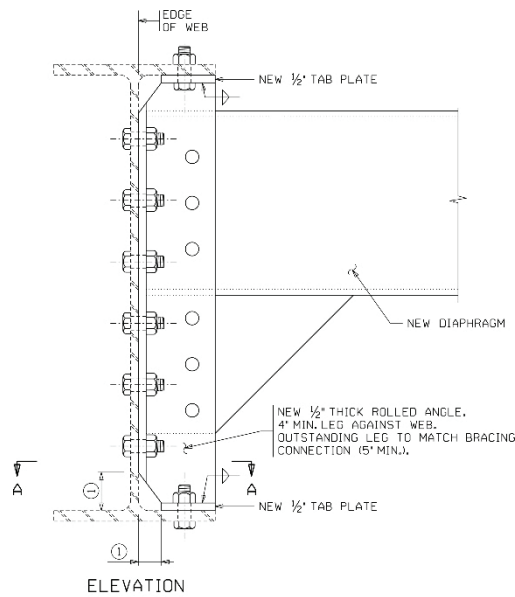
Elevation view of new bracing connection (Minnesota DOT)
